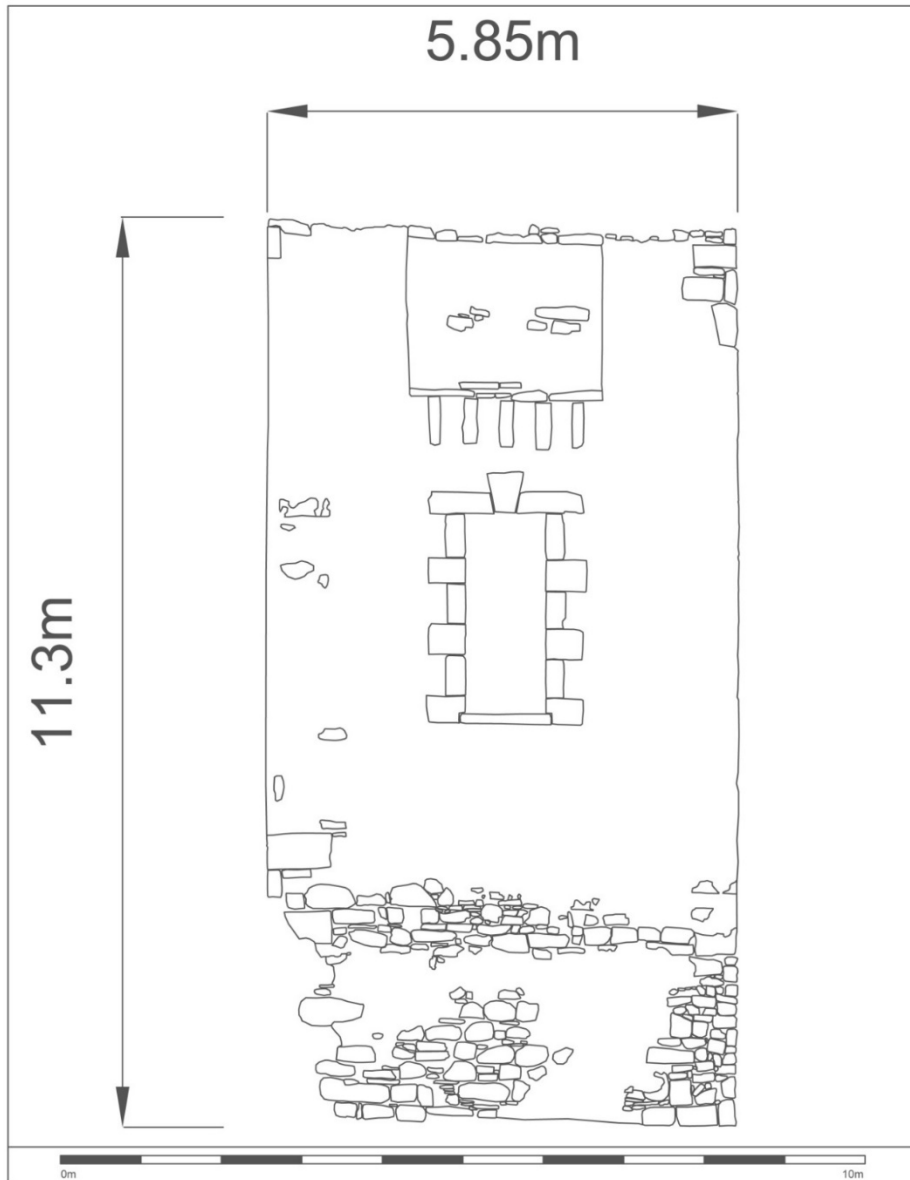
External elevation of the north wall of the signal tower at Rathlee Signal Station.
